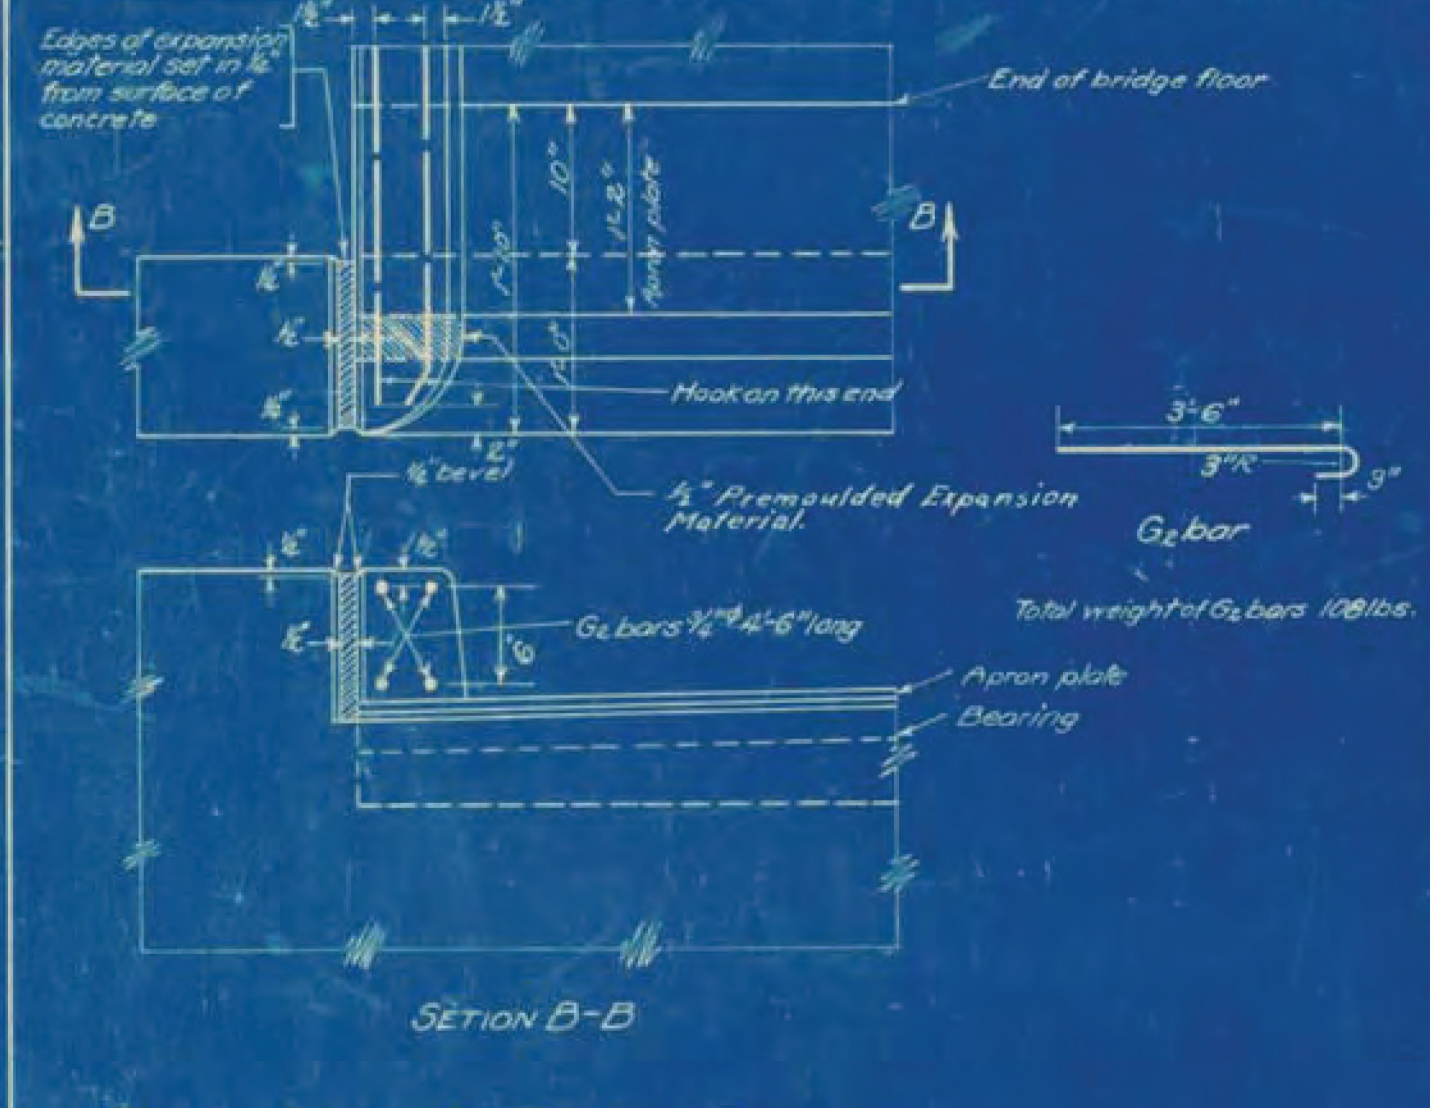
DETAIL OF EXPANSION MATERIAL FOR TEE BEAM BRIDGES STANDARD DETAIL-5223
